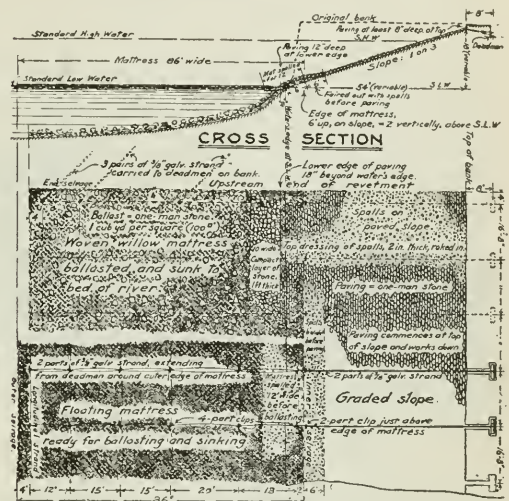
General Plan, Combination Concrete and Willow Mattress Revetment
